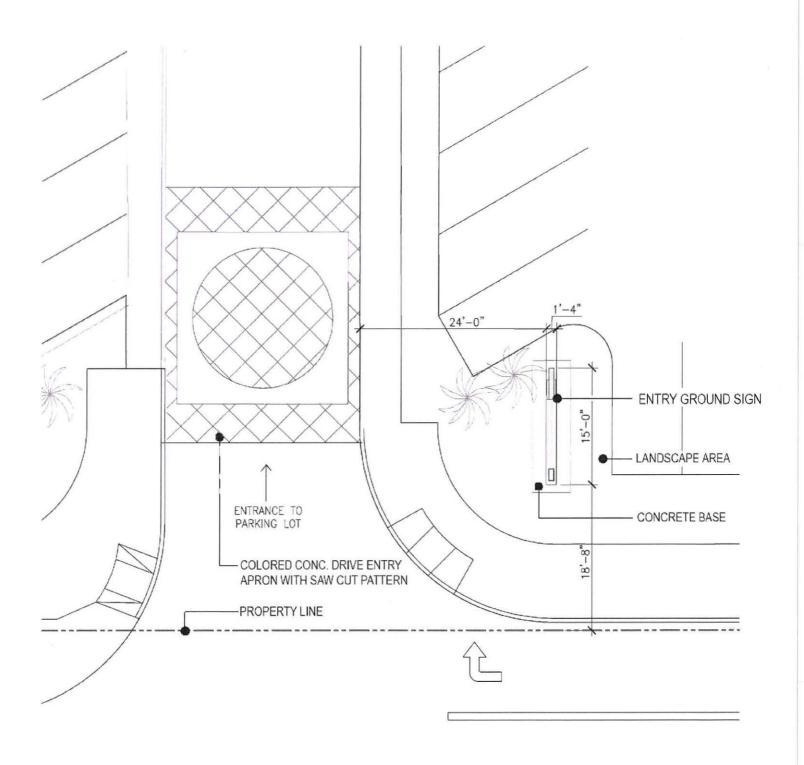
GROUND SIGN TYP. LOCATION
